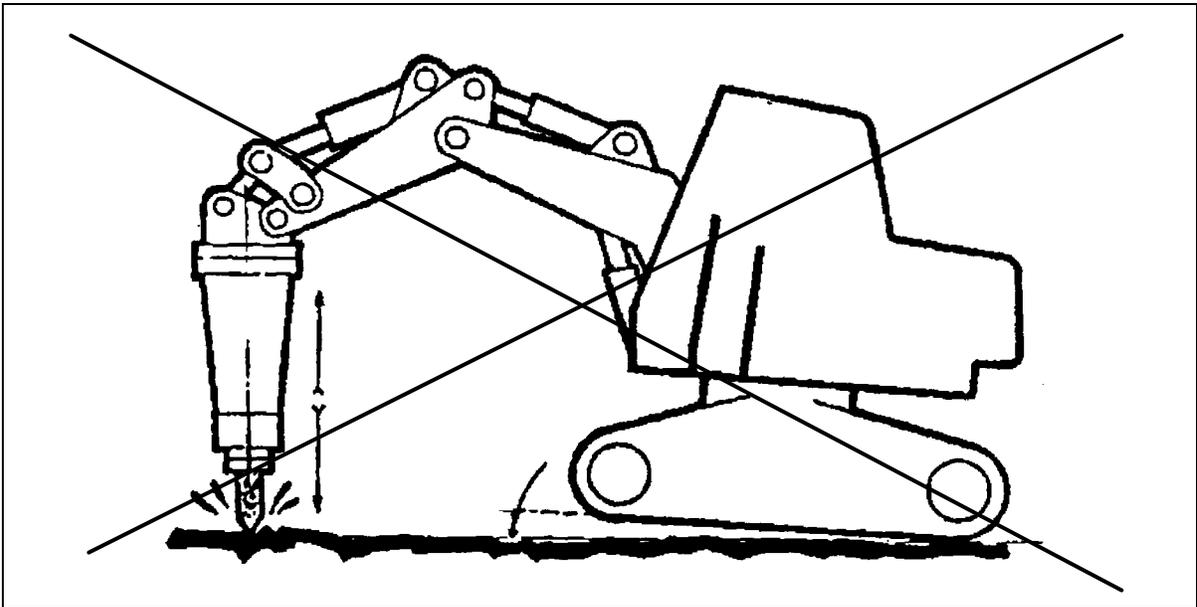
Do Not Rotate Carrier on the Breaker's Tool
